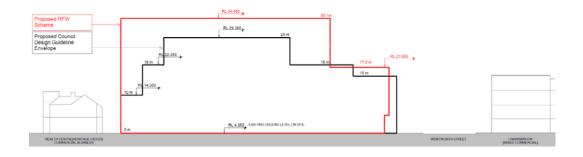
Overlay of South Steyne Elevation (Source: Architectus, SK-100)
